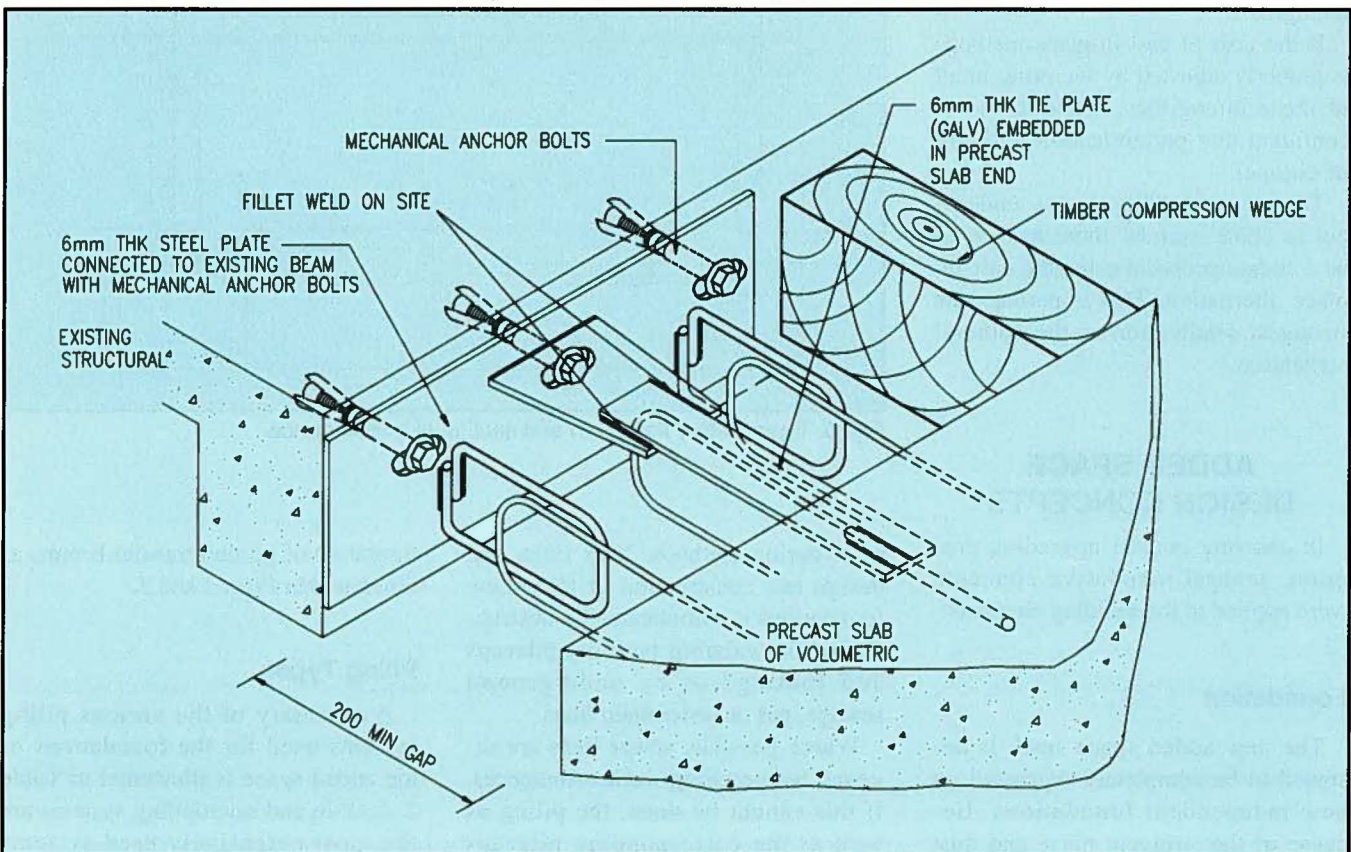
Tie connector between precast concrete added space slab end and existing building peripheral beam modified for temporary structural bracing.
